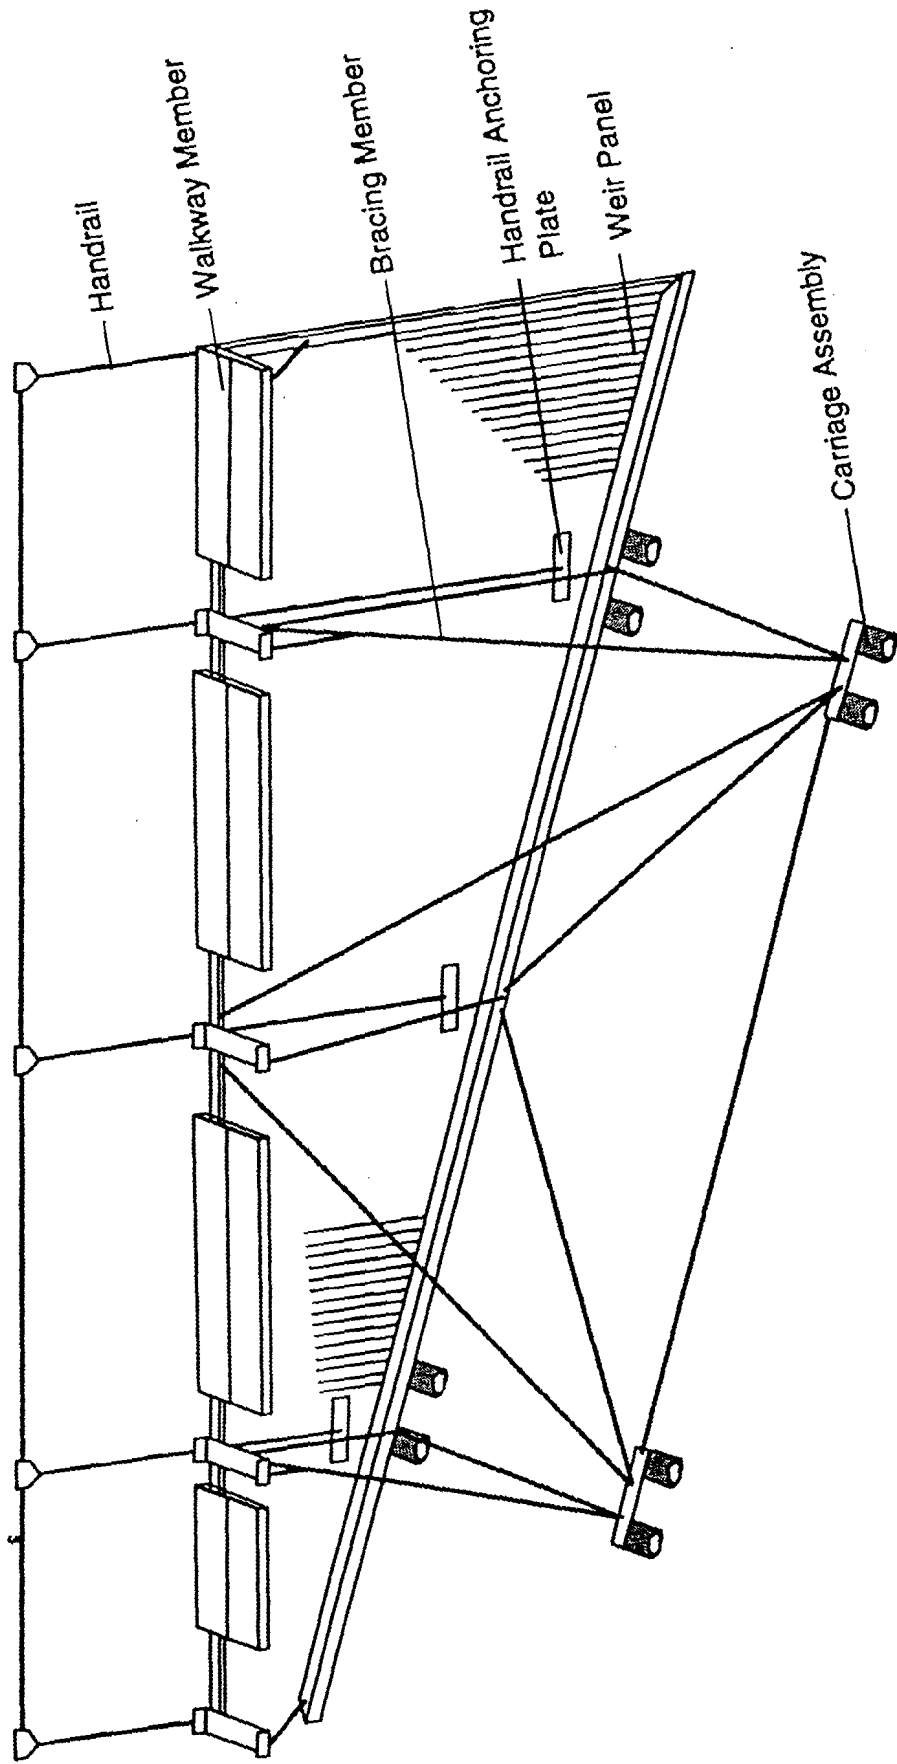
Schematic of diversion weir showing weir panel, bracing, carriage assembly and walkway with handrail.
